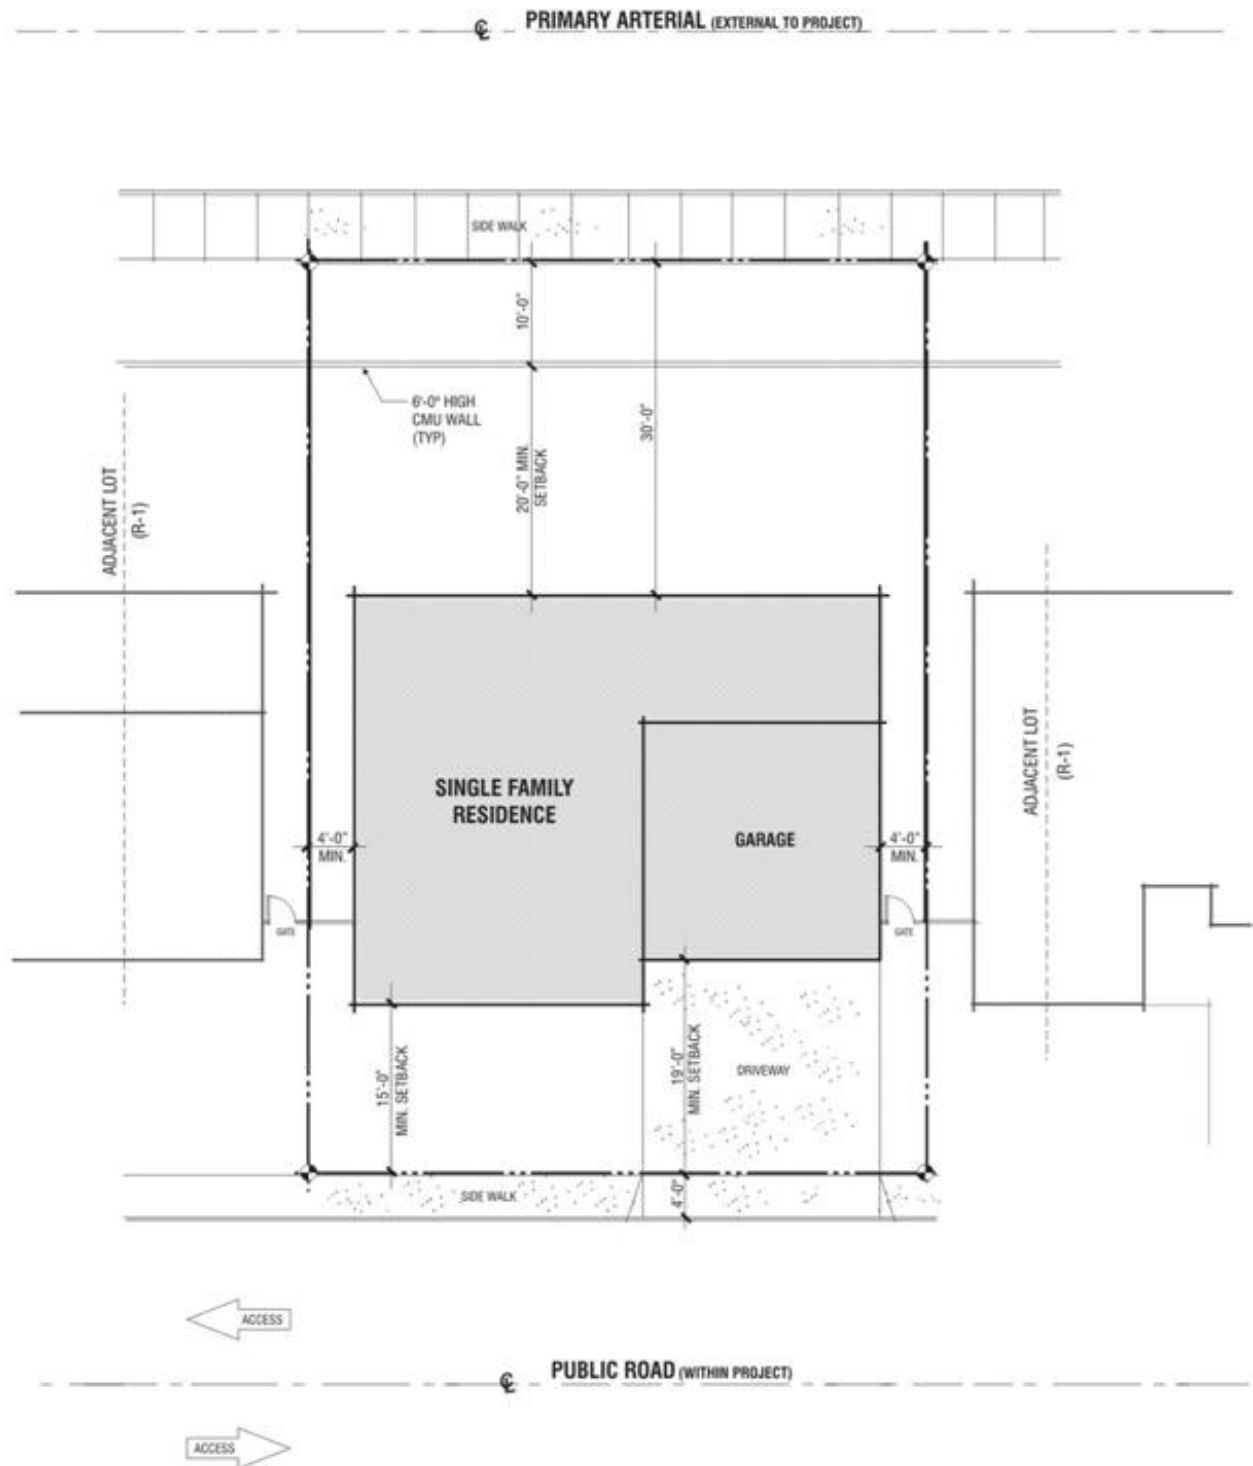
Diagram indicating building setbacks for the following: dwelling rear yard setback adjacent to an existing R-1 single-family residence; dwelling side yard setbacks adjacent a primary arterial and an R-1 lot
